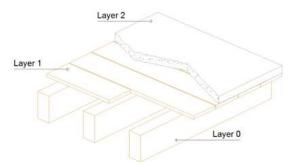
Layers in a typical timber joist floor (Timber Tech)
